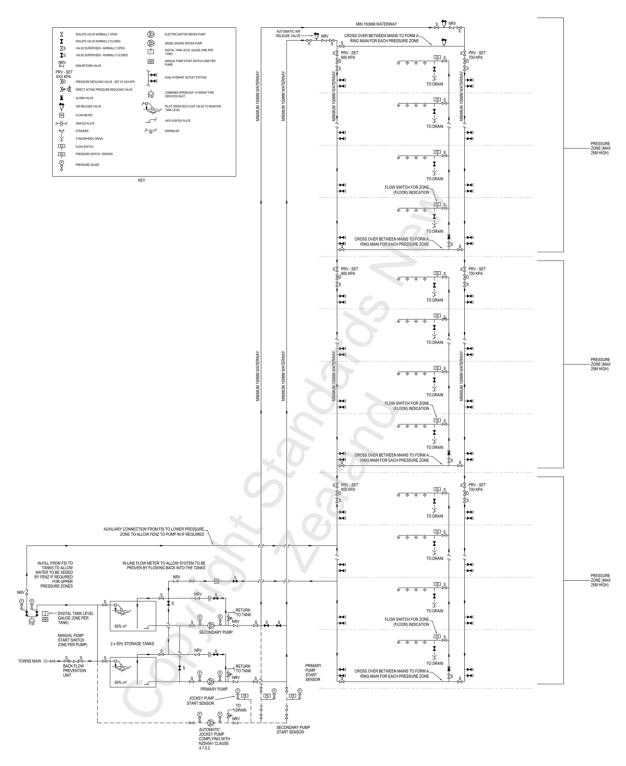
Combined fire sprinkler and fire hydrant riser for increased resilience – Two riser layout
